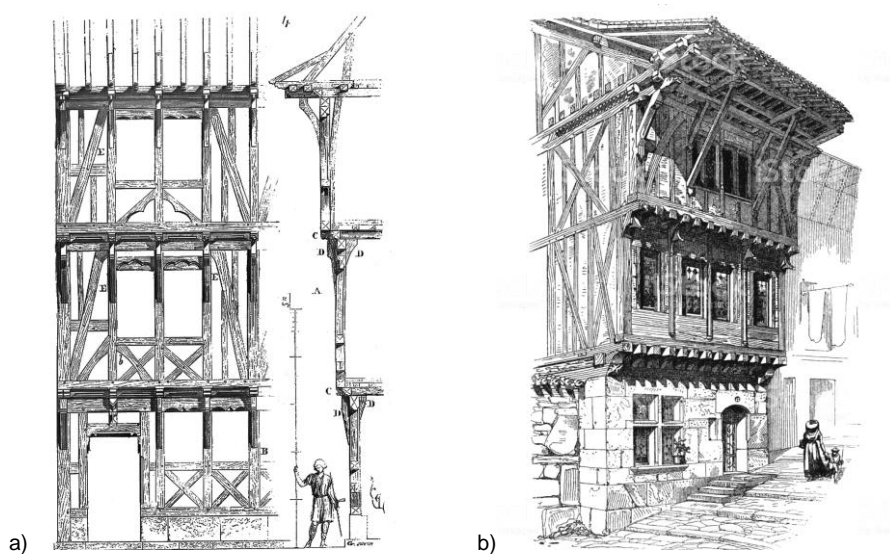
Violet-le-Duc, principle of timber frame wall construction: a - Medieval house in Dreux, b - House from the 14th century in Annonay. Source: Violet...
